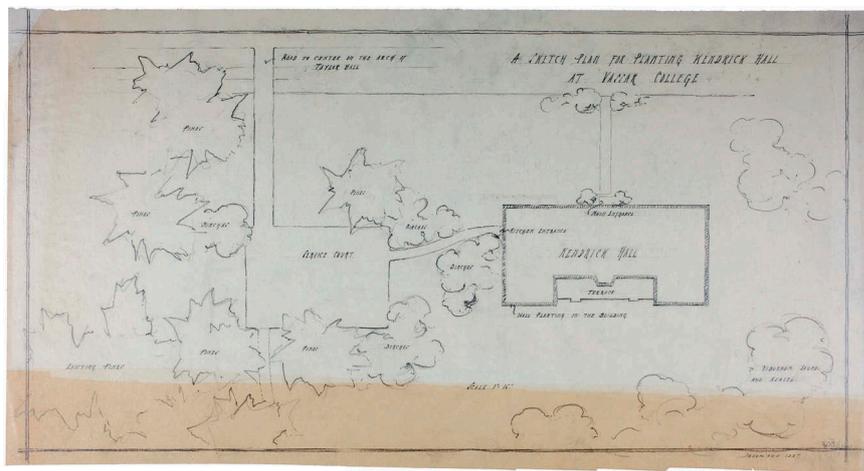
Beatrix Farrand, Vassar College, Planting plan for Kendrick Hall, December, 1927 (EDA-UCB).
